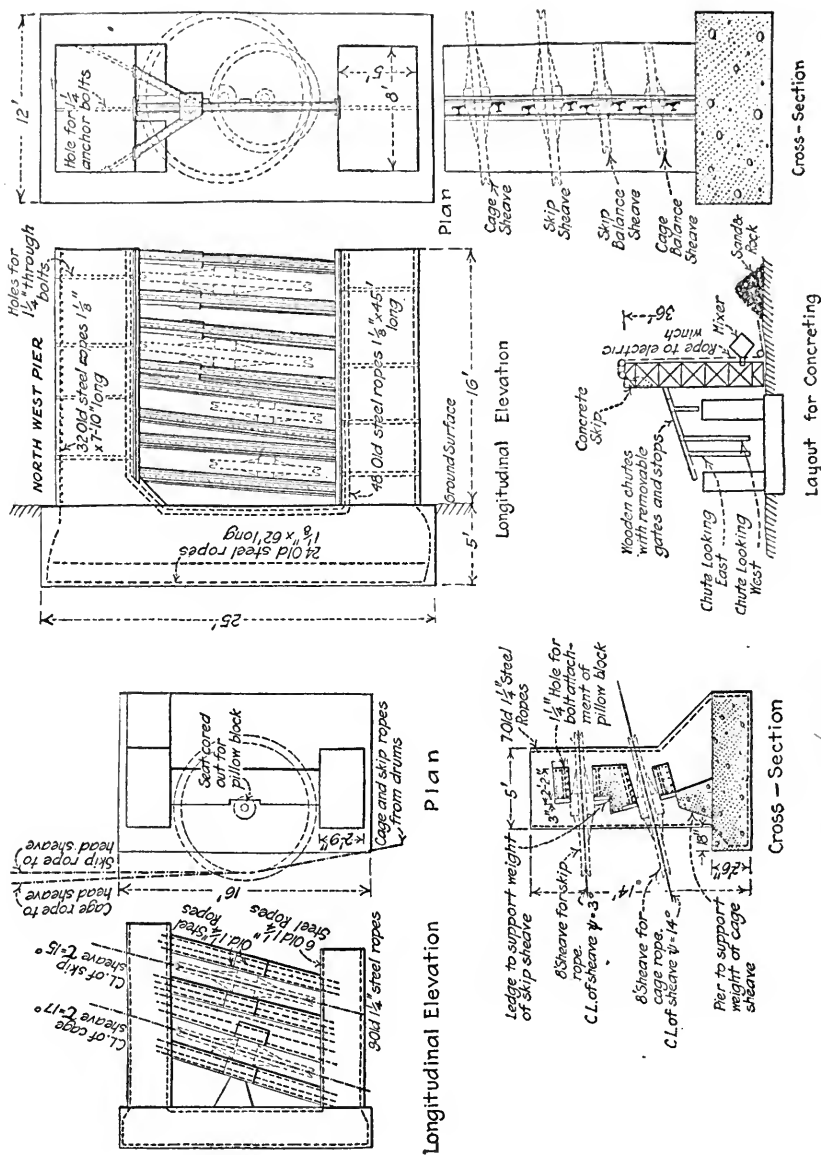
CONCRETE ANGLE-SHEAVE FRAME AT EAST VULCAN MINE.
